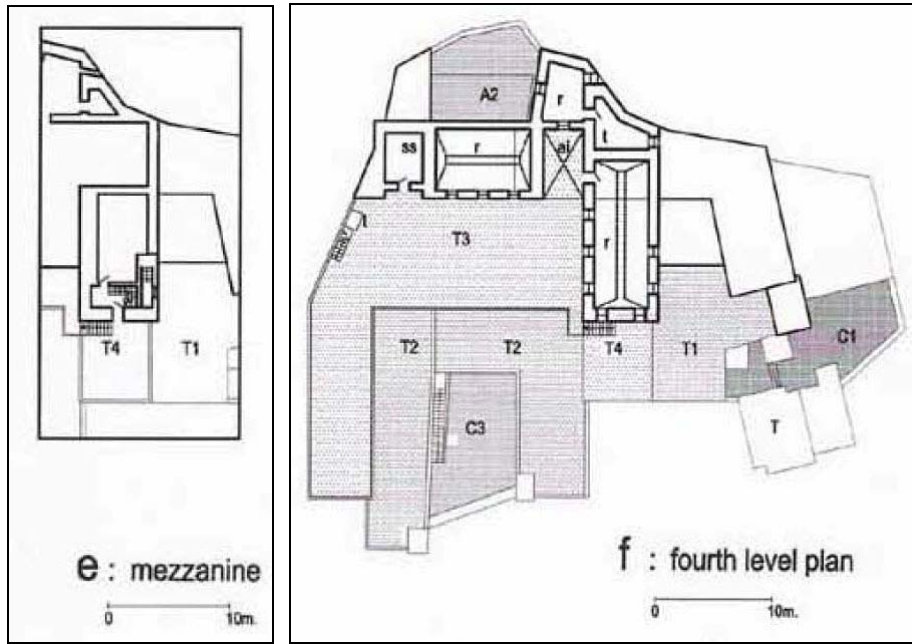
e: Mezzanine and f: Fourth Level Plan (Alioğlu (2003.132-133))
